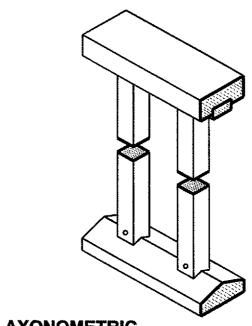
Exterior Connection: Infill Picket Nailed to Endcap - Endcap Screwed to Rail
